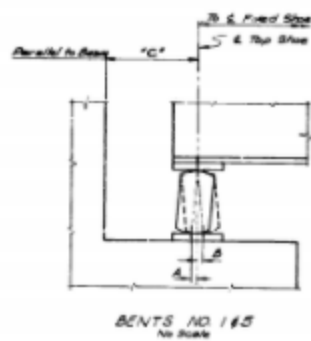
Abutment Detail of the Bridge (NBI 40300) (1960)
